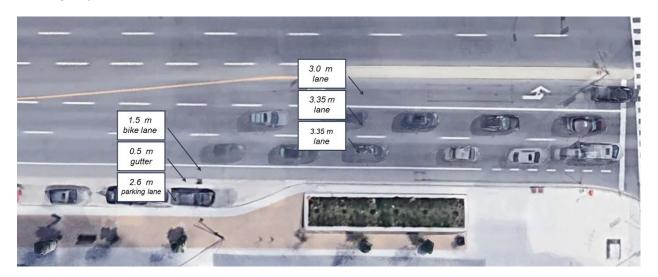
Confederation Parkway existing lane widths, between Rathburn Road West and Burnhamthorpe Road West
